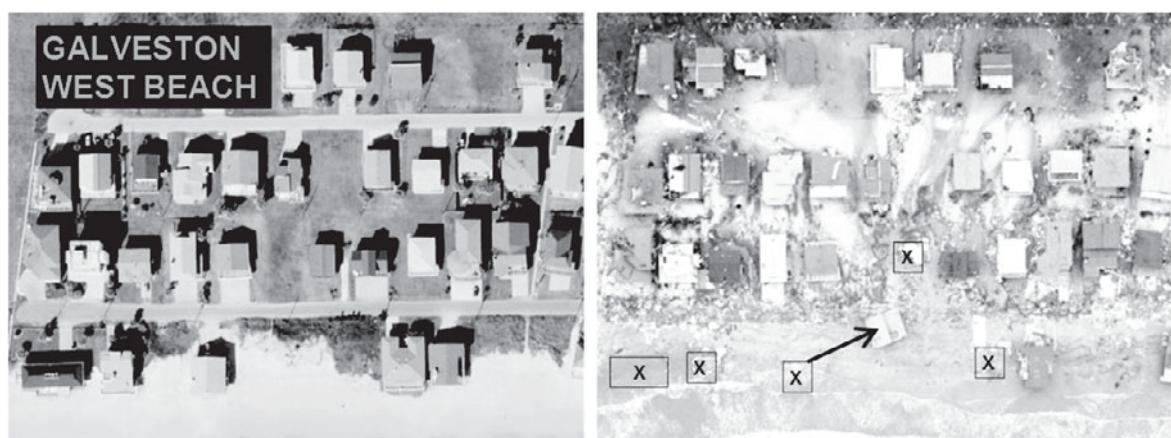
Destroyed and floated houses on West Beach primarily due to shoreline erosion around shallow piling foundations. Source: Houston Area Council and NOAA images
